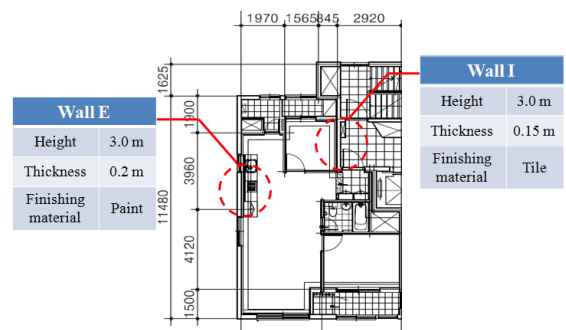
Details of walls selected for lifecycle CO₂ assessment in the typical floor of apartment building
